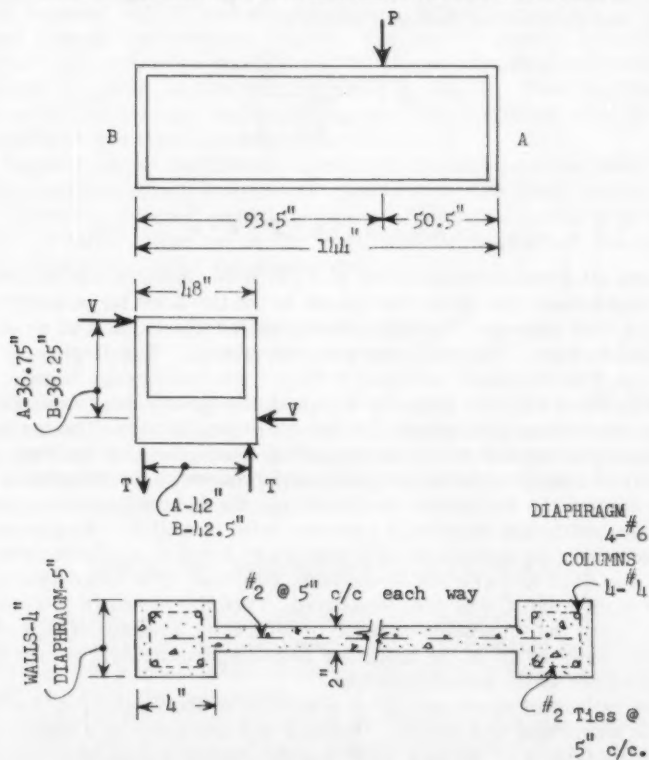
TYPICAL SECTIONS. SPECIMEN SD-2.
